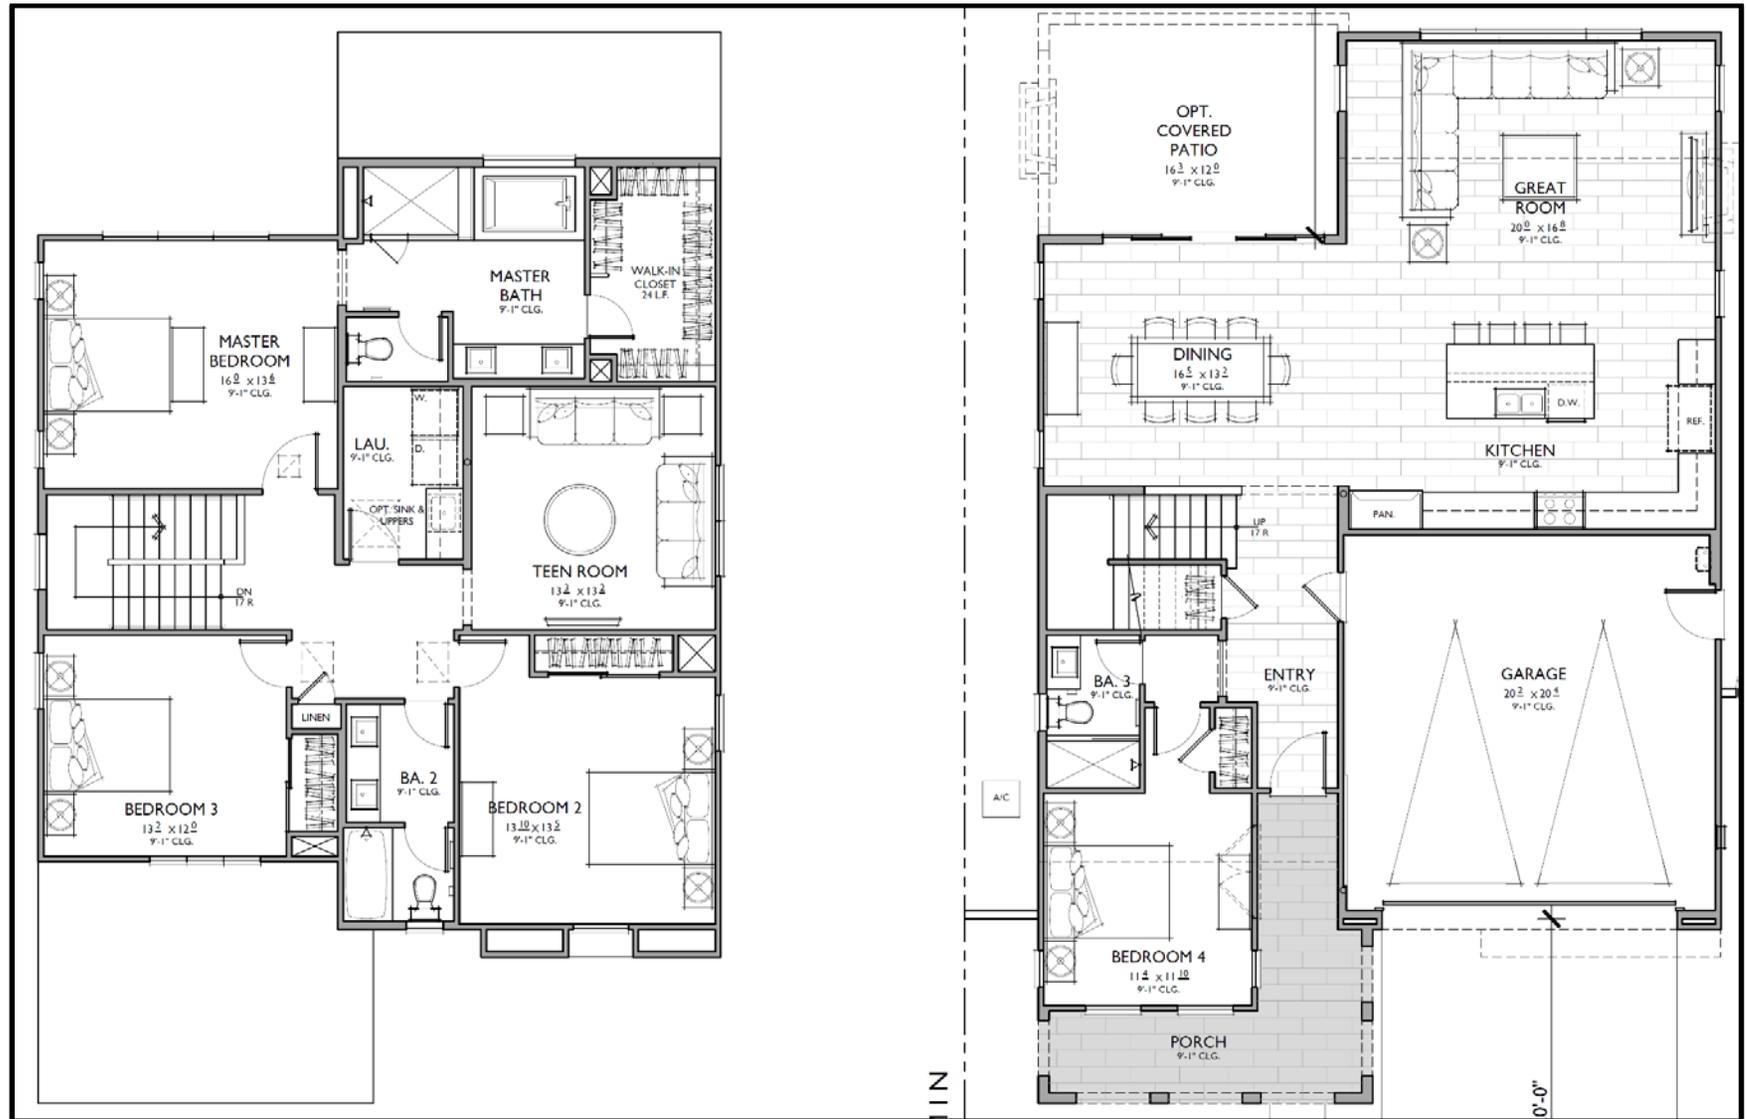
Exhibit B — FLOOR PLAN AND EXTERIOR ELEVATIONS — PLAN 2
